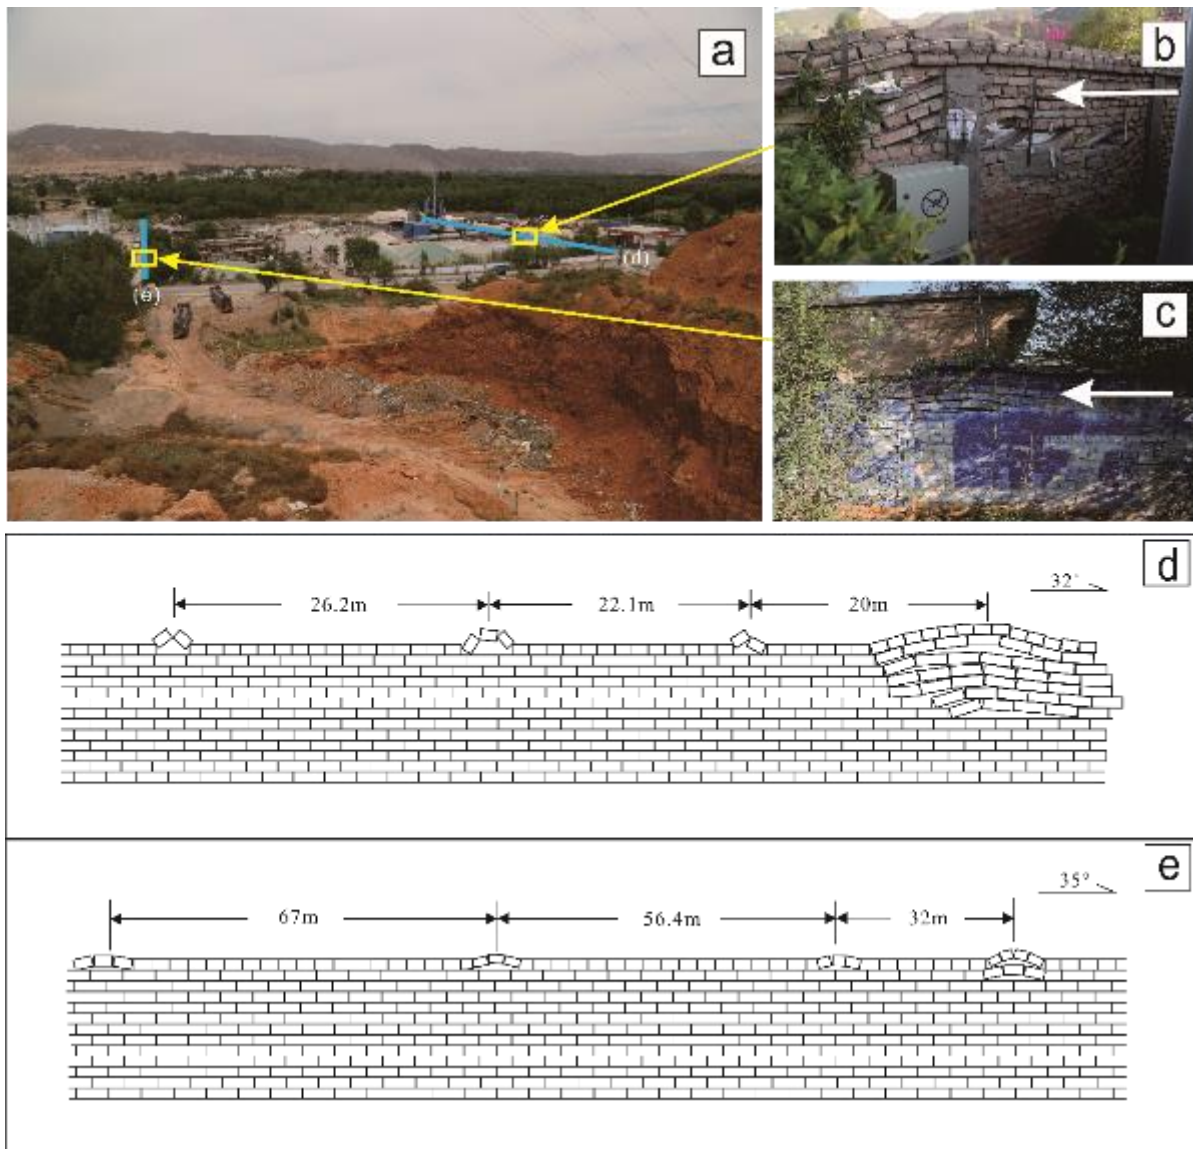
Example of wall deformation and extrusion at the front of the slope. a Walls of the factory located in the front of the bedrock landslide. b Arching of the east wall. c Arching of the west wall. d Sketch map of the east wall that subjected to uneven deformation. e Sketch map of the east wall that deformed with unequal spacing.
